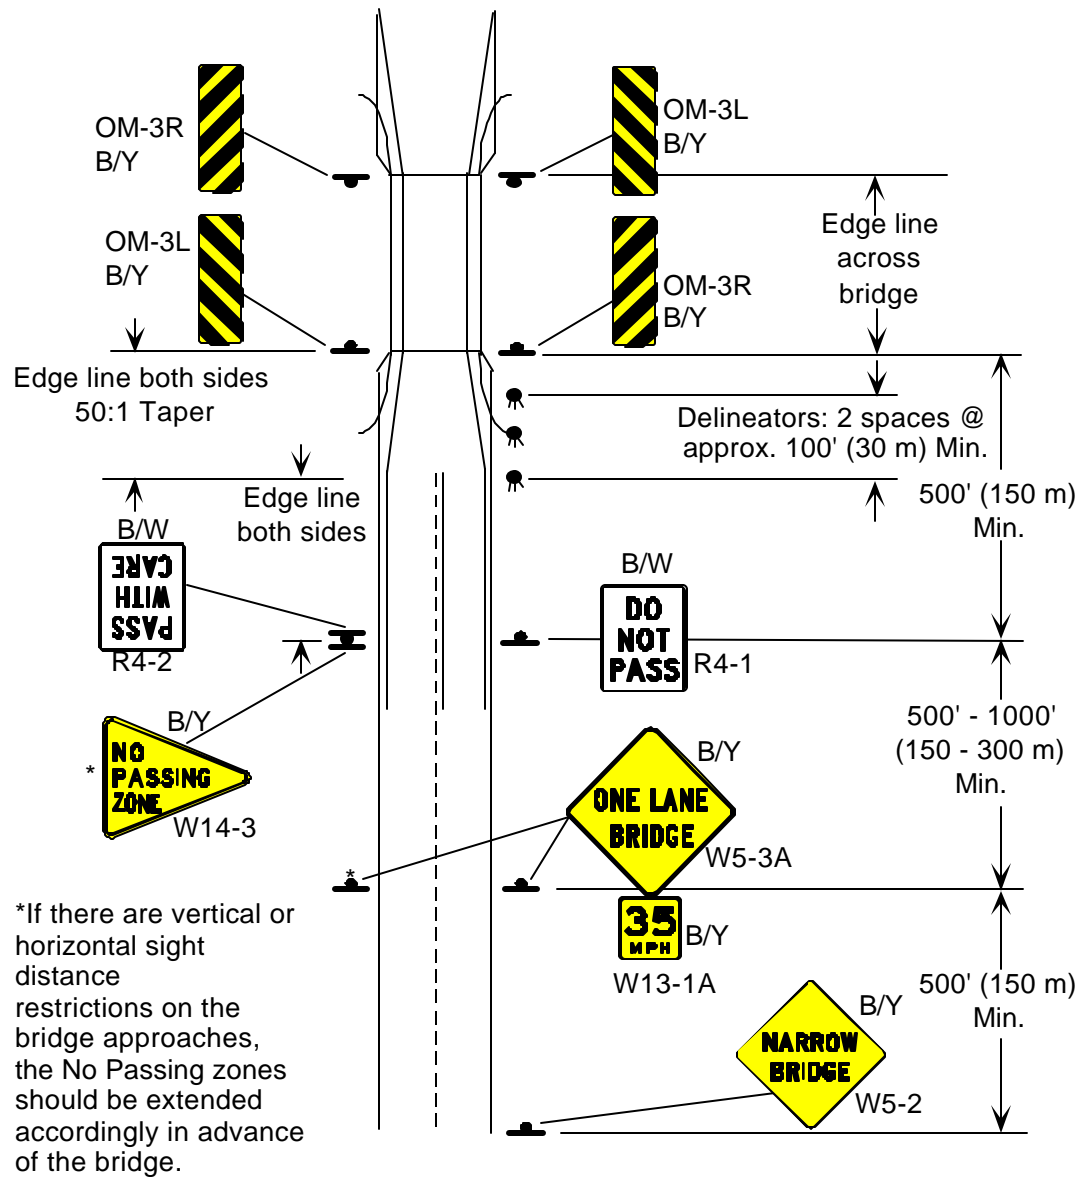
Signing And Pavement Markings For Bridges 18' – 22' (5.5 M – 6.7 M) In Width
